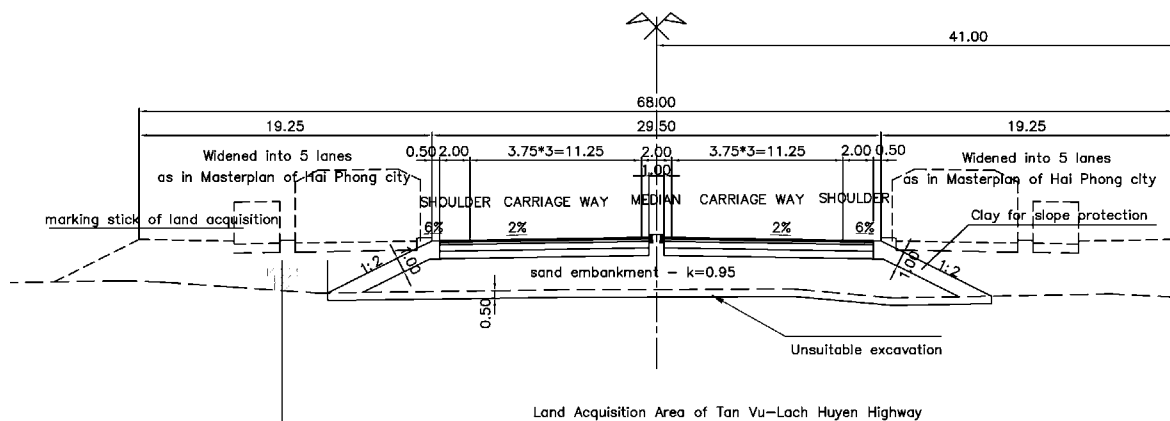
and 2.2.3 show the typical cross sections for the first stage and second stage, respectively. Details for the application of the stage construction are described in Section 2.4.3.
